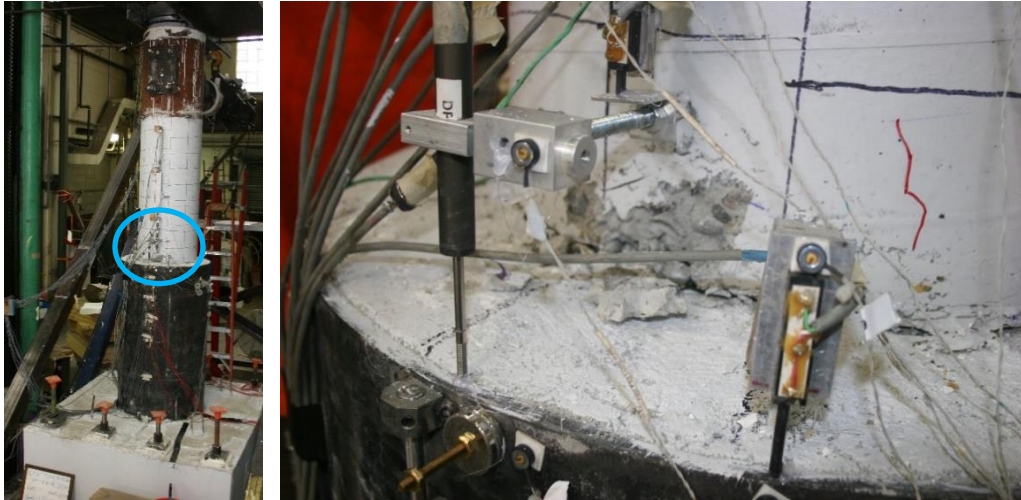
Specimen 30-21-R Spalled Region at Base of North Face of Column at 2.4% Drift
